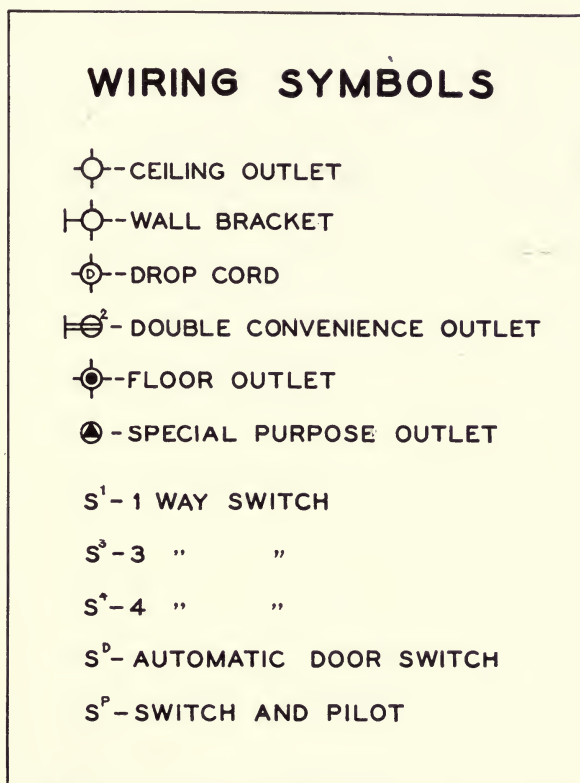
Interpretation of symbols for reading the wiring of house plans.
